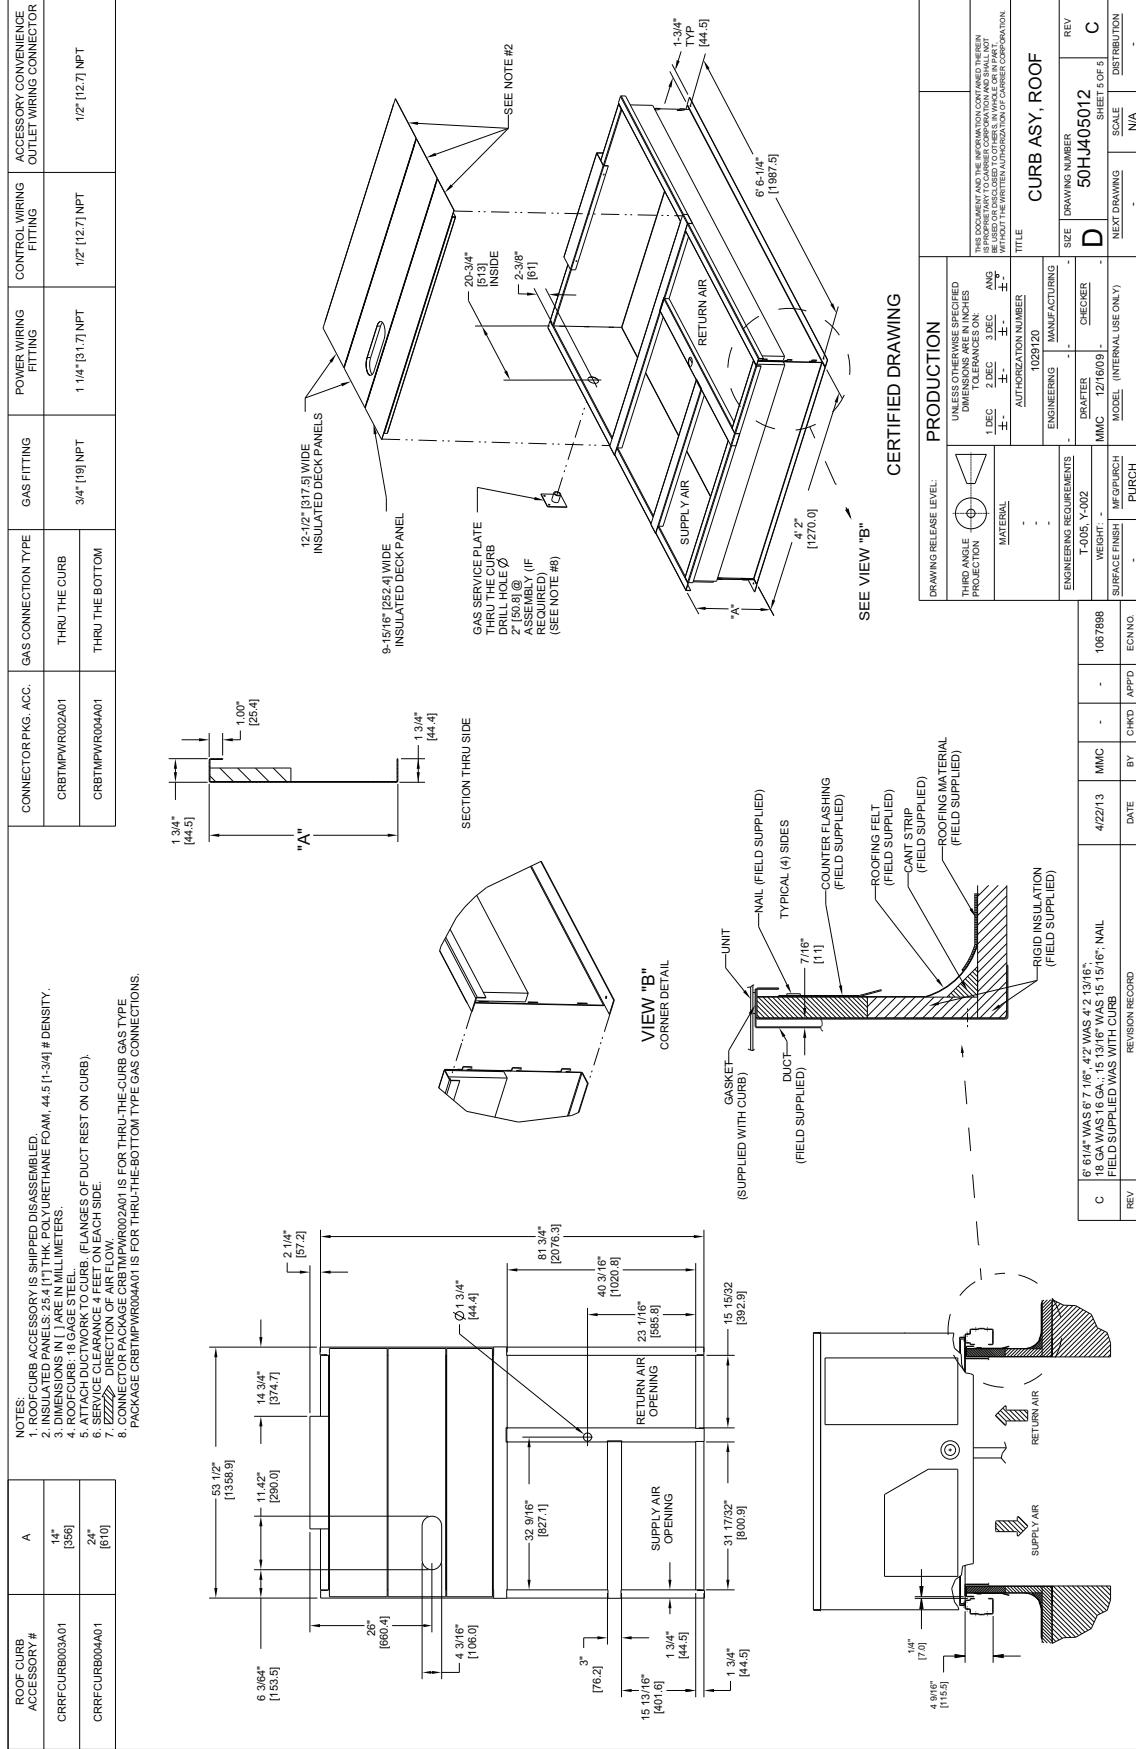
582K\*\*08-14 Roof Curb Details
